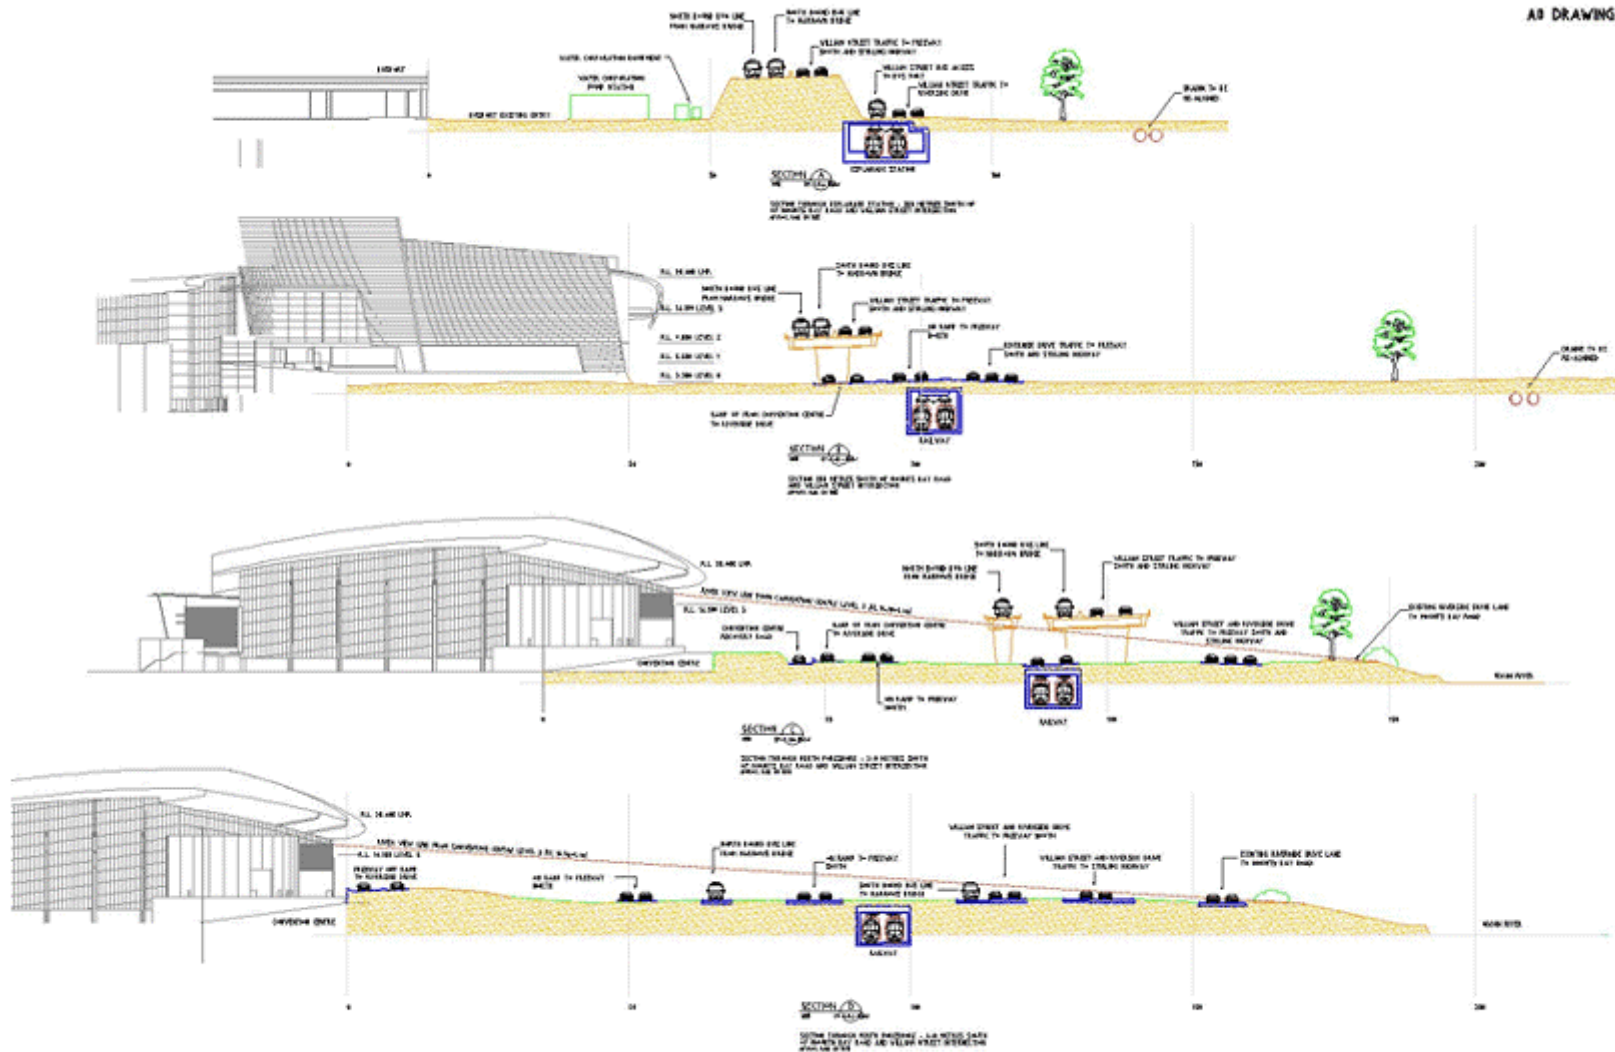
Cross Sections Showing View from Perth Convention Centre with William Street Bridge Retained
